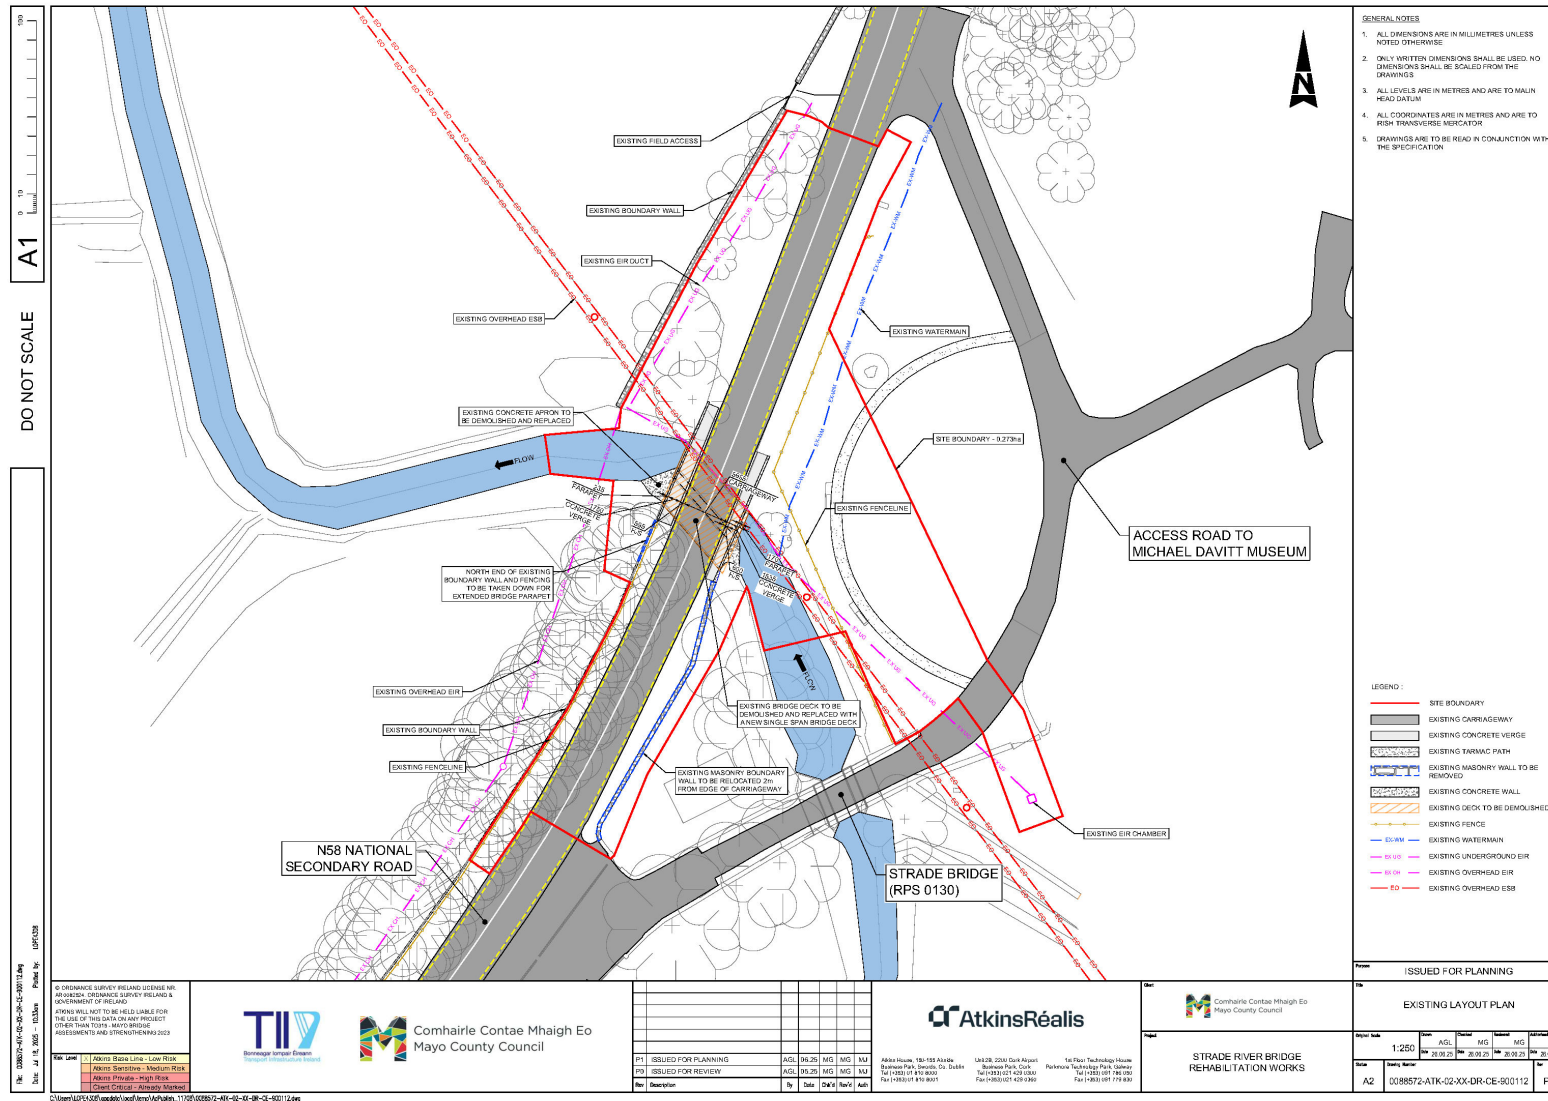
Overview of existing layout plan at Strade River Bridge.
